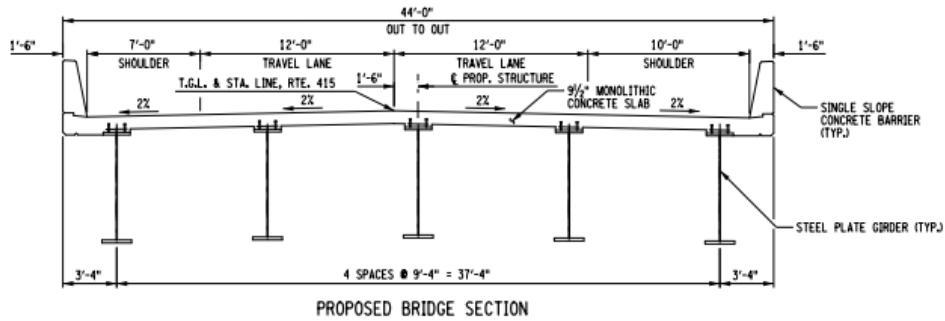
Deck cross section of NY Route 415 bridge over Meads Creek
